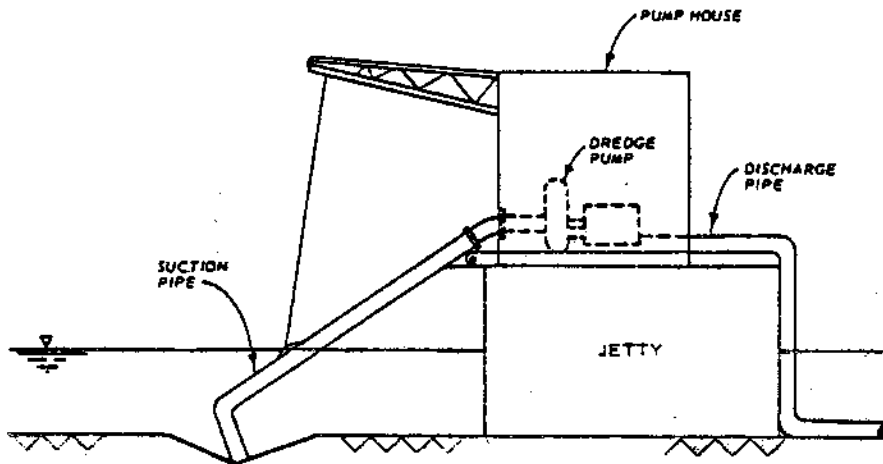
Fixed Bypass System - Schematic Layout (Richardson, 1977, p. 71)
